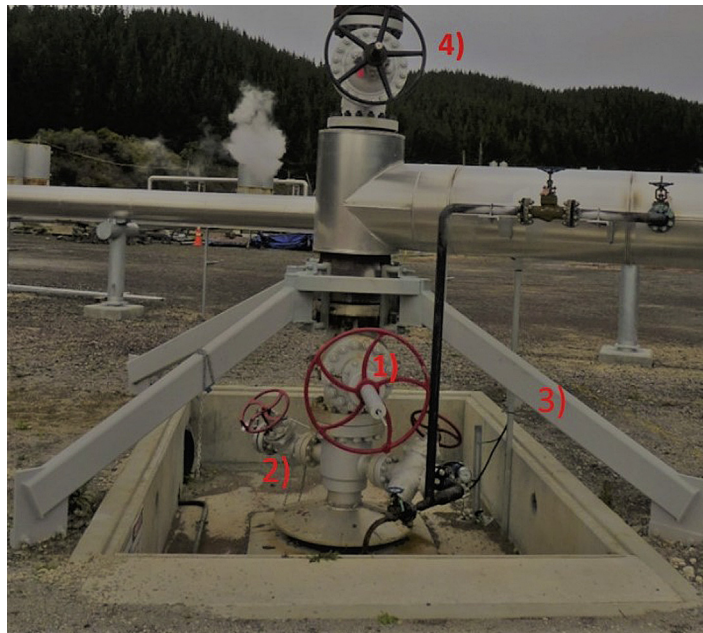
Producing conventional wellhead assembly showing: (1) master valve, (2) side valves, (3) thrust frame and (4) service valve.
